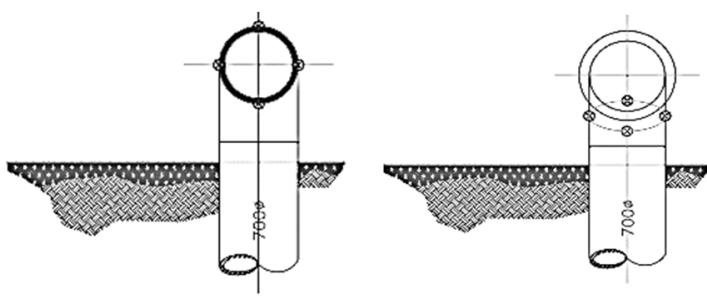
Test Points - Cross sectional view of Section 1 and Section 3
